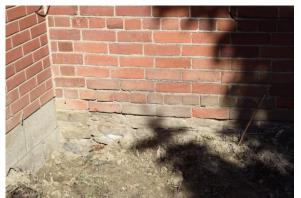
Stone foundation on west elevation Plate 36: Recent renovation work on west
